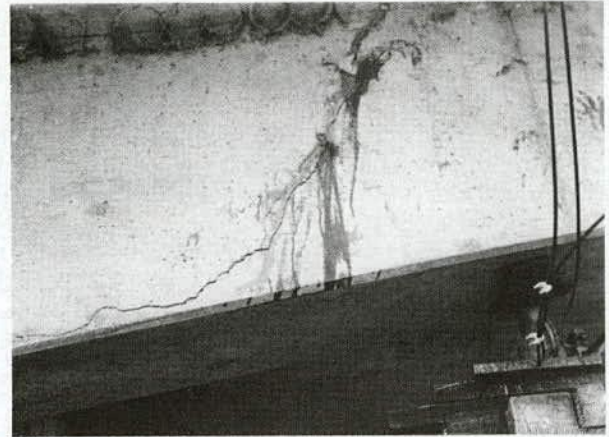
Shear crack in bridge; girder support is to left. (Photo Courtesy of Finley and Turnipseed)
